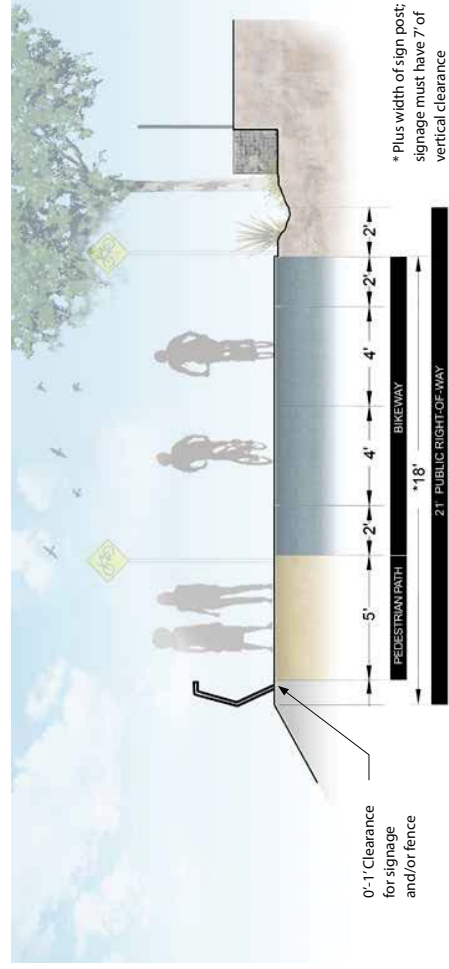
Yolanda Avenue to Reseda Boulevard - Typical Cross Section
